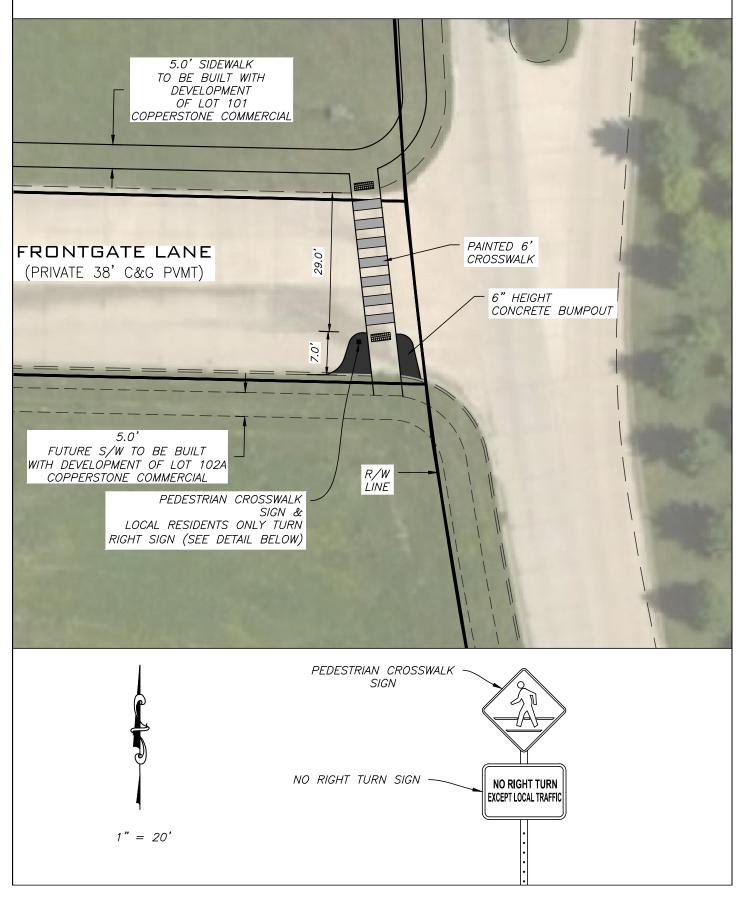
EXHIBIT B: FRONTGATE DR CROSSWALK IMPROVEMENT
